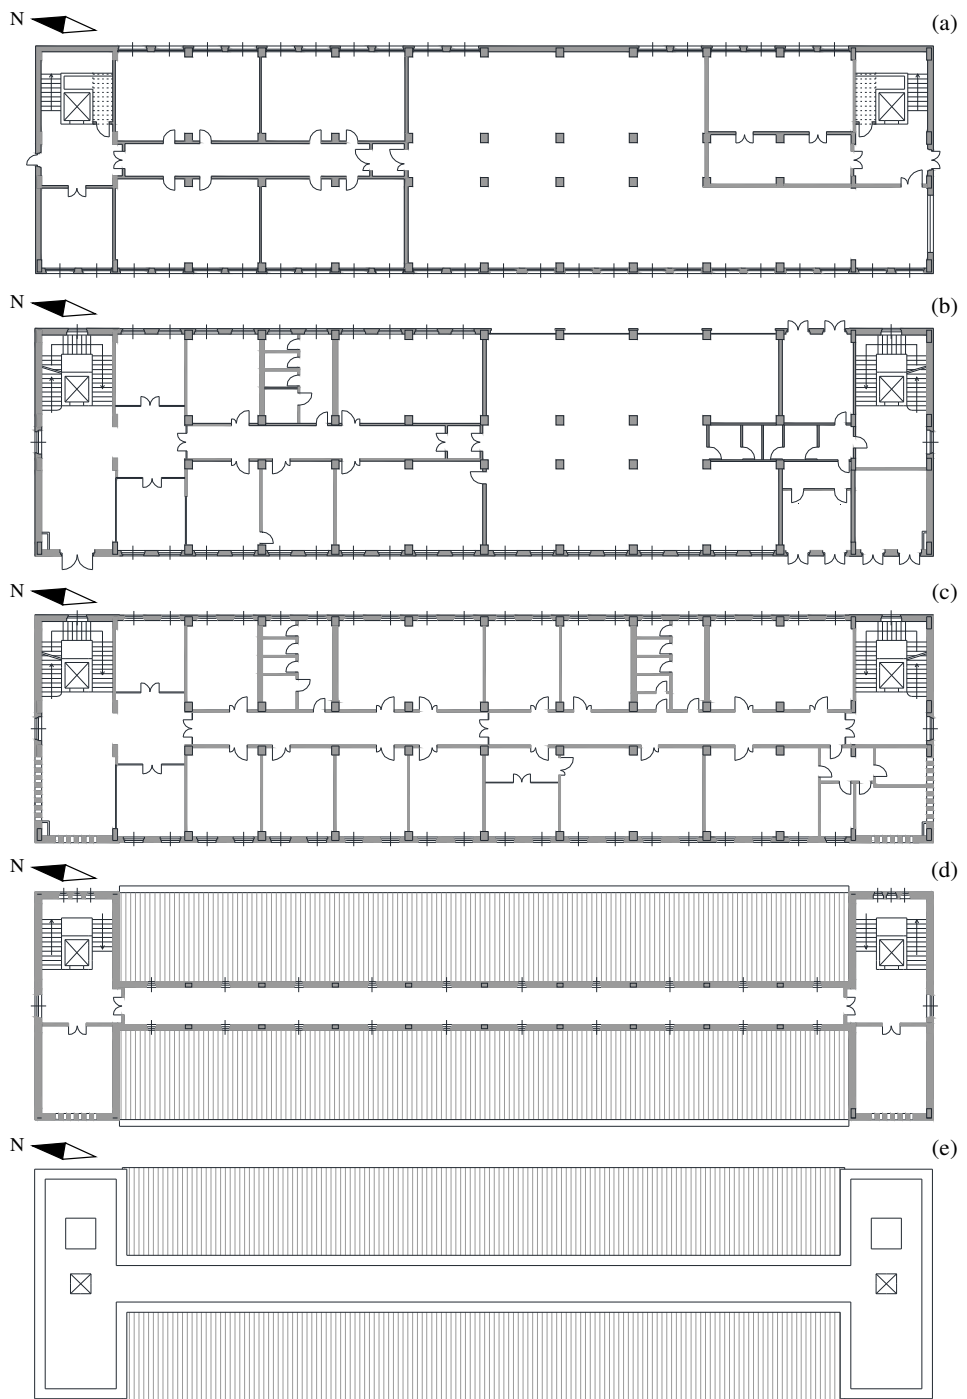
Architectural plans: (a) underground floor, (b) ground floor, (c) first floor, (d) attic floor, (e) roof.
